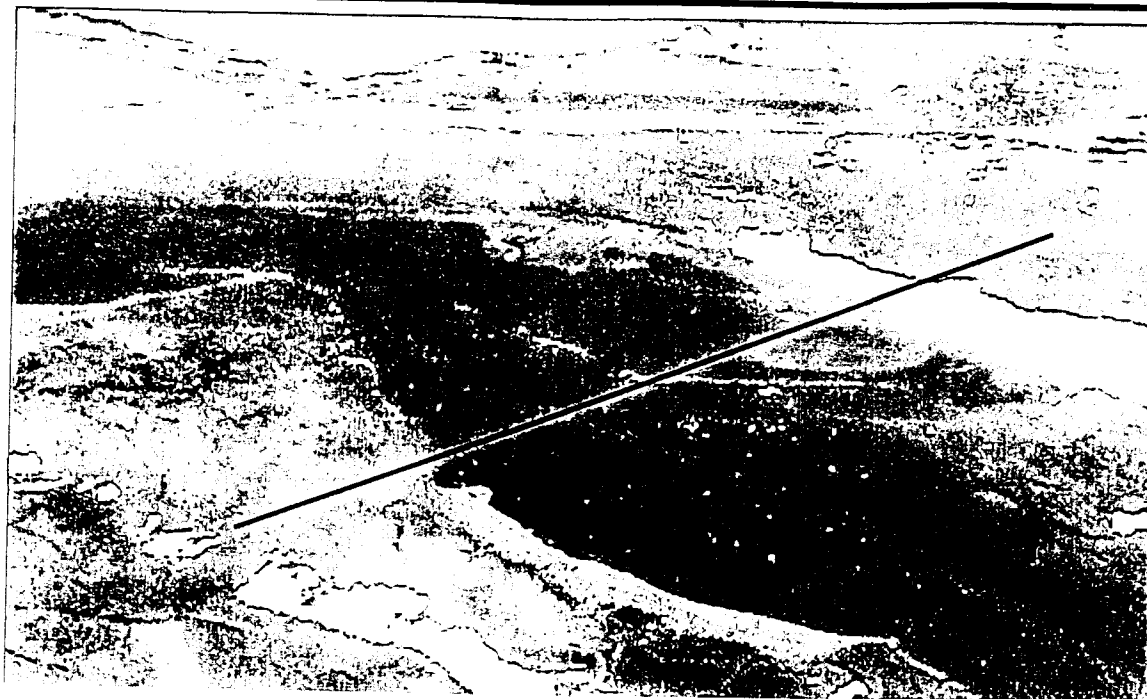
Looking northeast at the proposed pipeline crossing (5/30/98).
